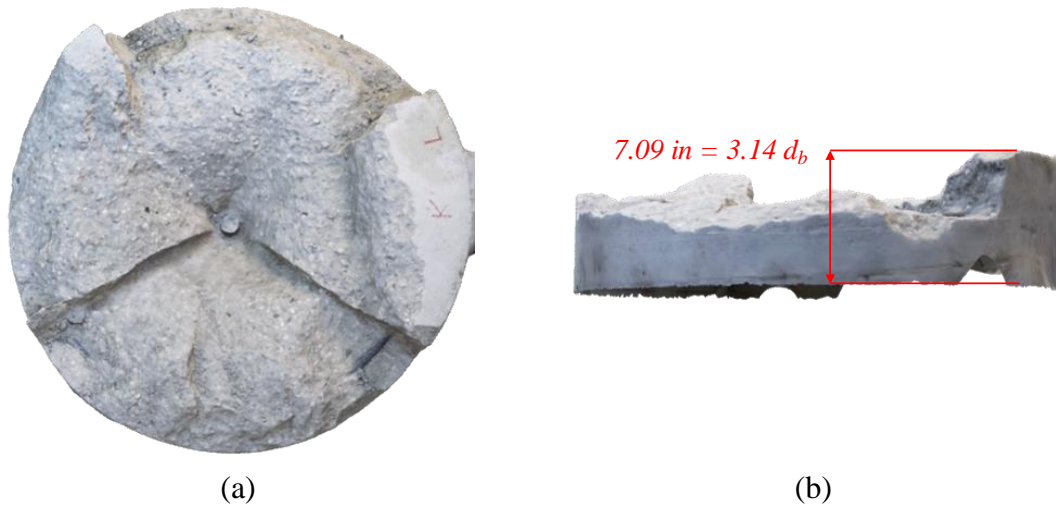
3D Point Cloud Model of Fracture Surface of Test Specimen #3: (a) Plan View; (b) Cone Shaped Fracture
